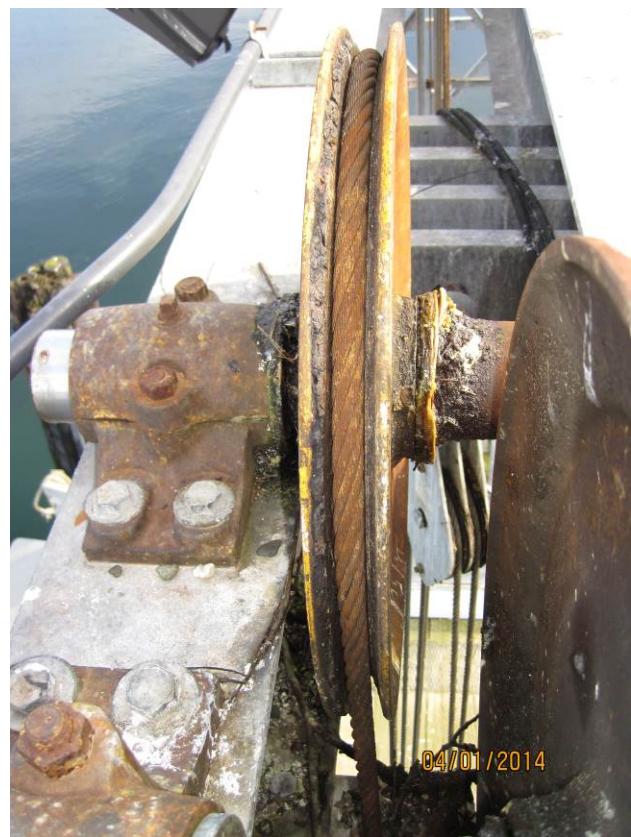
Dry lifting cable above at the tower sheave. Some surface rusting.
